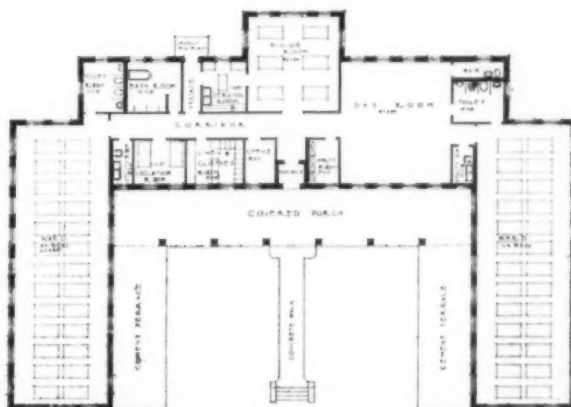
Floor plan of the cottages for tubercular patients to be erected at Lincoln State School and Colony, Dixon State Colony, and Alton State Hospital. The wards are provided with three sash windows so that all four sides can be thrown open.
